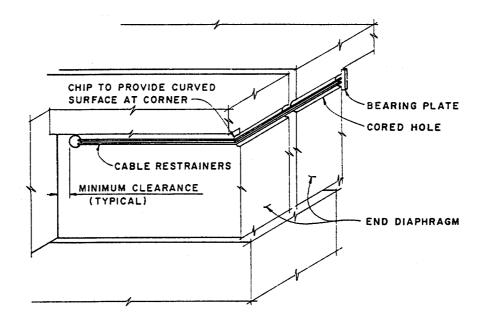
Expansion joint retrofit detail for concrete T-beam.
